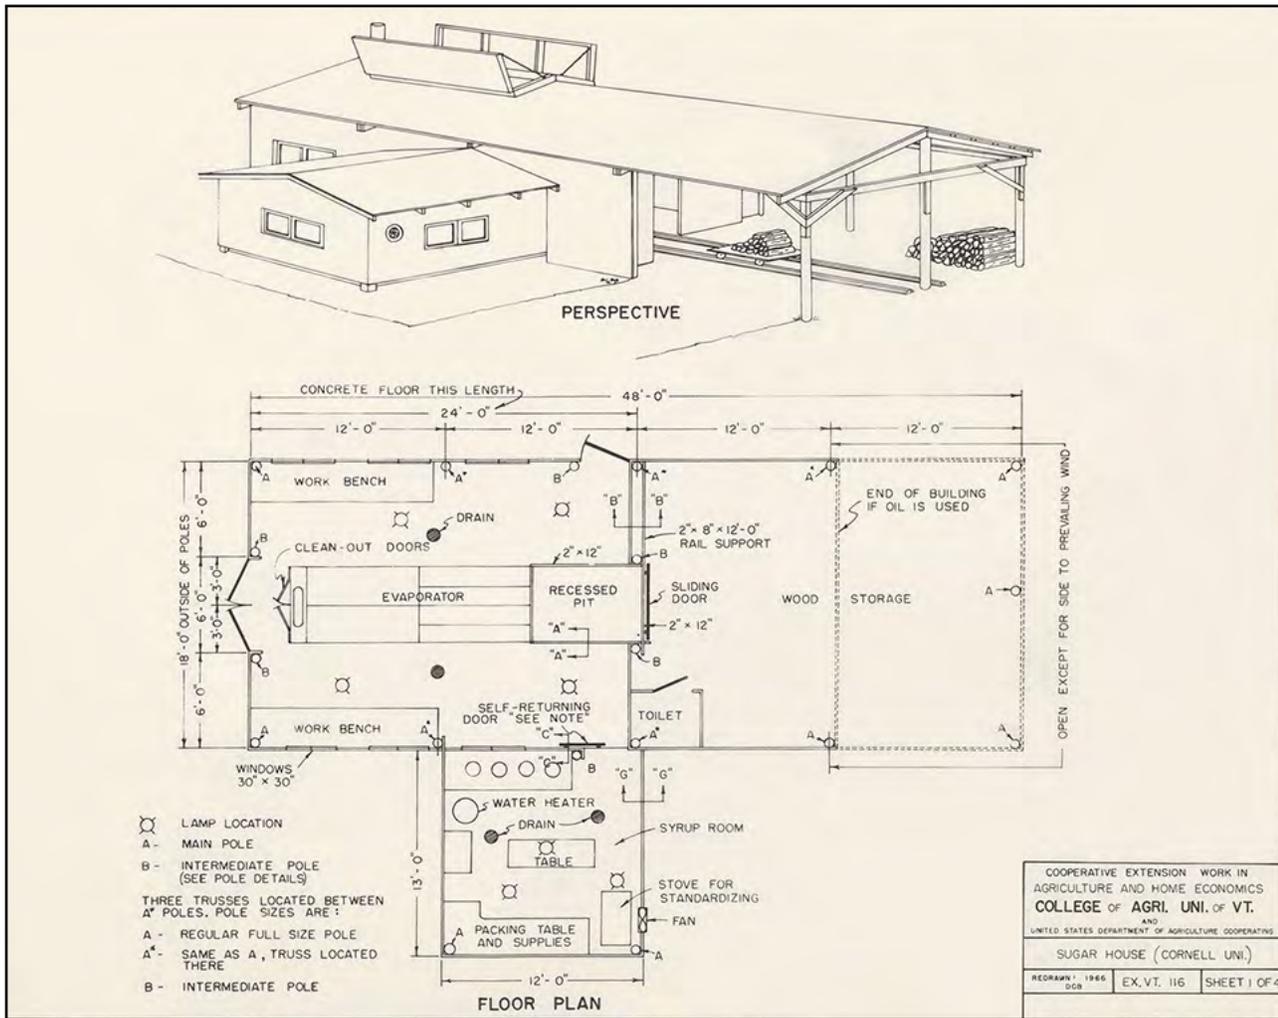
An elaborate set of blueprints is not necessary, but a simple, well-drawn diagram will be very helpful as you plan and construct a sugarhouse.
